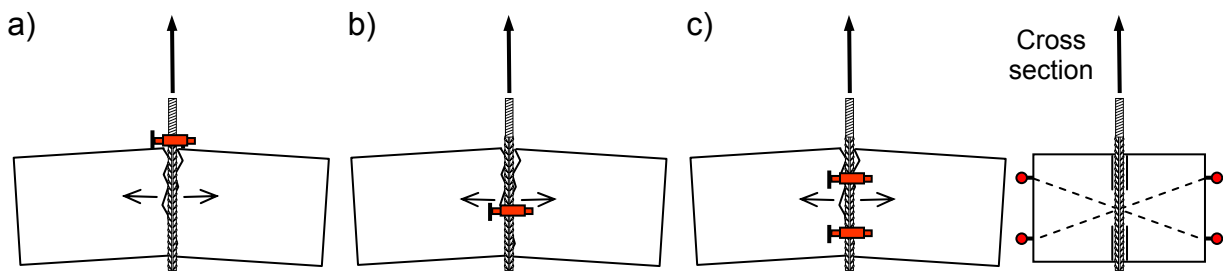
Measuring crack widths: a) Two transducers mounted on top; b) Two transducers attached on the sides; c) Four transducers to achieve best accuracy
